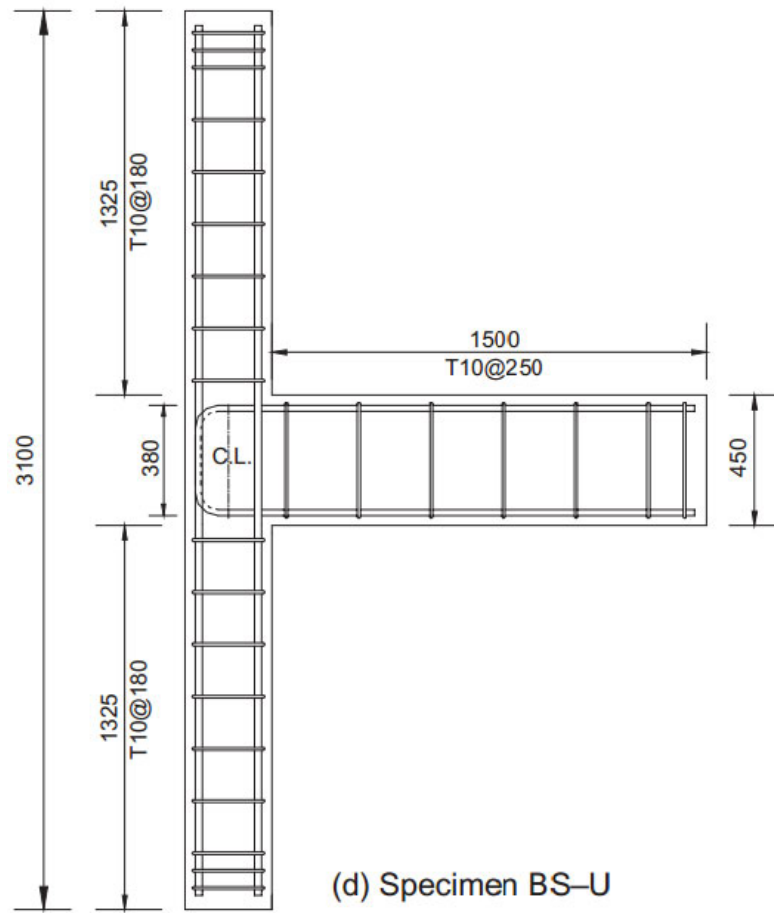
Test units BS-U: dimensions and reinforcement details (Kuang and Wong, 2005)
